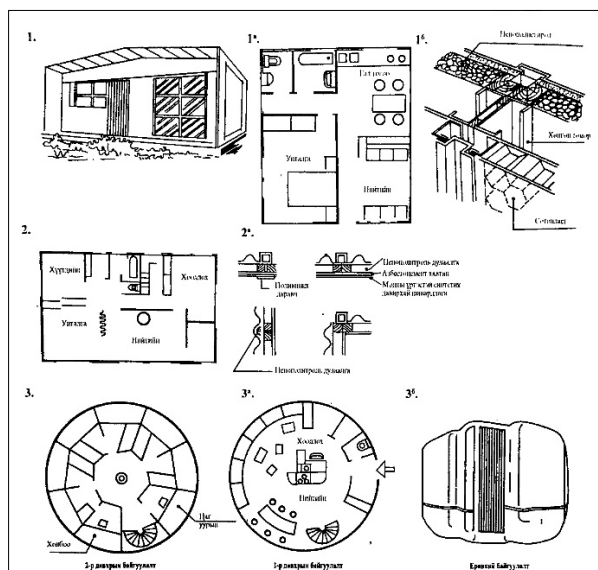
International prefabricated and portable dwellings 1-Housing in Osaka, Japan a. Plan b. Section 2-Housing in Poland a. Section of wall fixing b. Second floor plan of an expedition house in France a. First floor plan [20]
